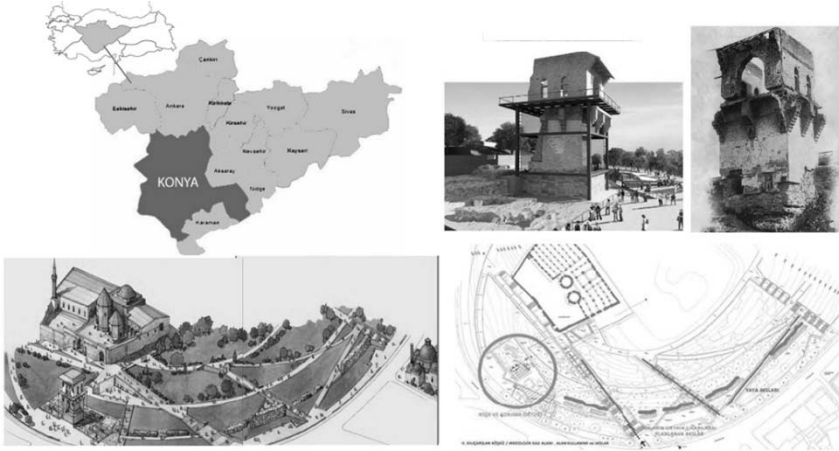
Kılıçarslan II Pavilion, its position and characterization in the lay out plan Archeological Excavation Field Landscape Design Project, (TKB & ÇEKÜL, 2014)
